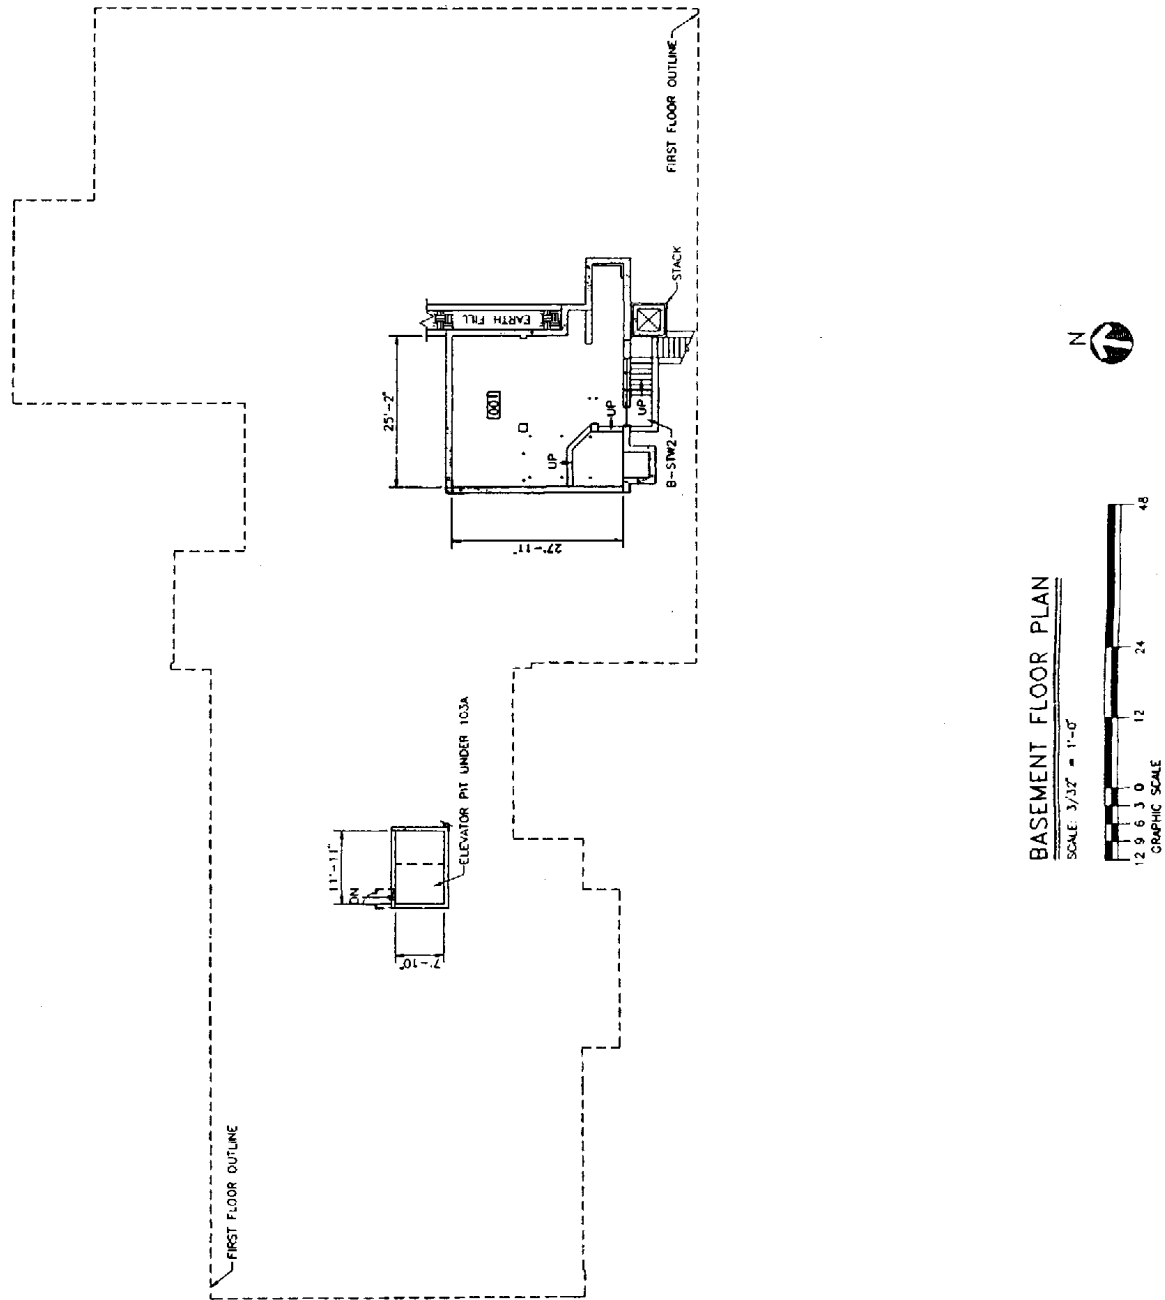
Basement Floorplan of Omega West Building 2-1.
